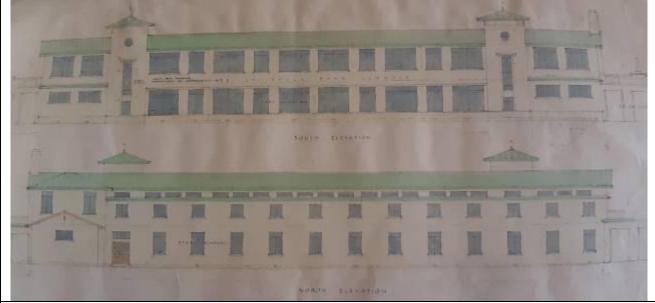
Elevation drawings of the central classroom block of the De La Salle Schools from the W. H Byrne Collection held by the Irish Architectural Archive (IAA Ref: 2006/142 POO336).
